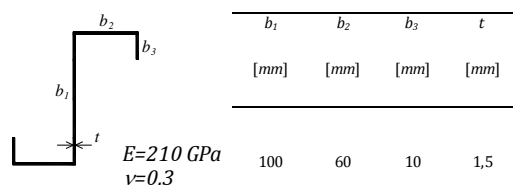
Z-section geometry, cross section dimensions and elastic constants.
